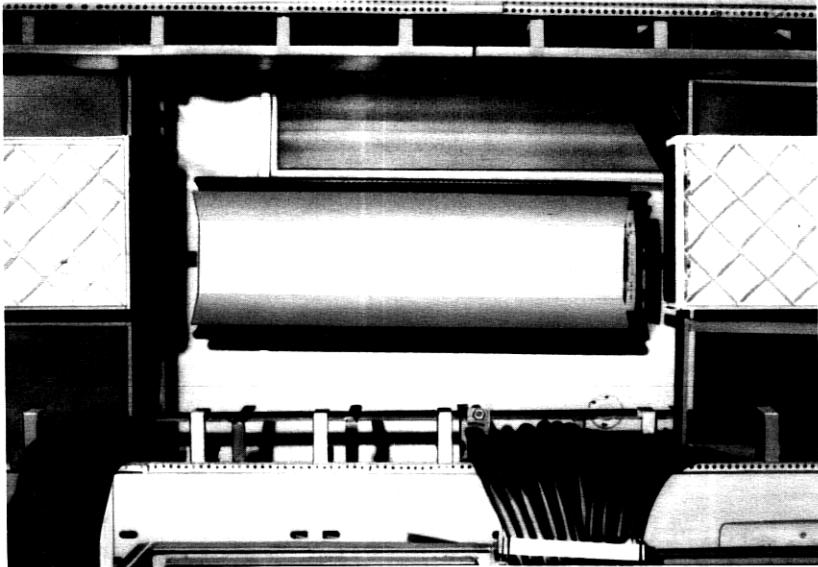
Laboratory photograph of ks-21599 lights and ks-21344 dropped air diffuser located according to Cable Pathways Plan (viewed from floor to ceiling).
